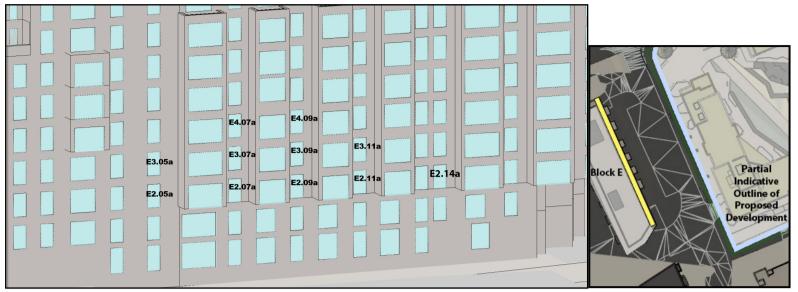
Concord block windows situated in proximity to bay type window columns
